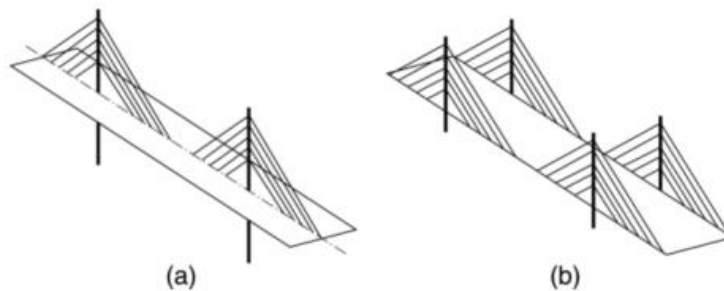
Typical Transverse Layout of Cables, (a) One Plane, (b) Two Planes [1]
